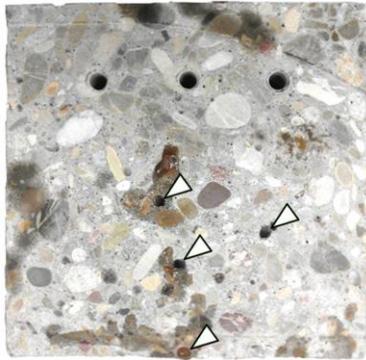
cross section cut from a concrete specimen containing 13 capsules per litre, where intersected capsules are highlighted with arrows.
